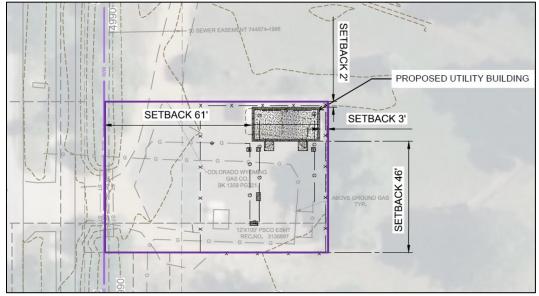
Site plan with proposed utility structure; the parcel lines are indicated in purple.
